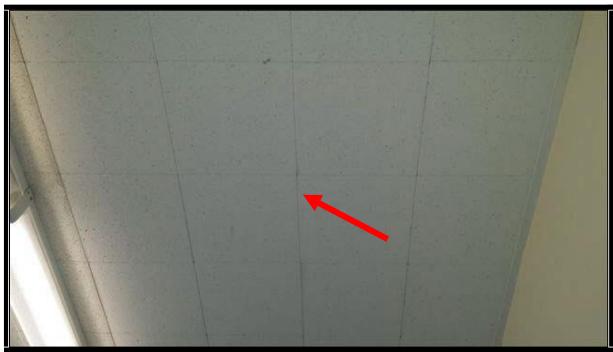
1'x1' Fissured Ceiling Tile, White
